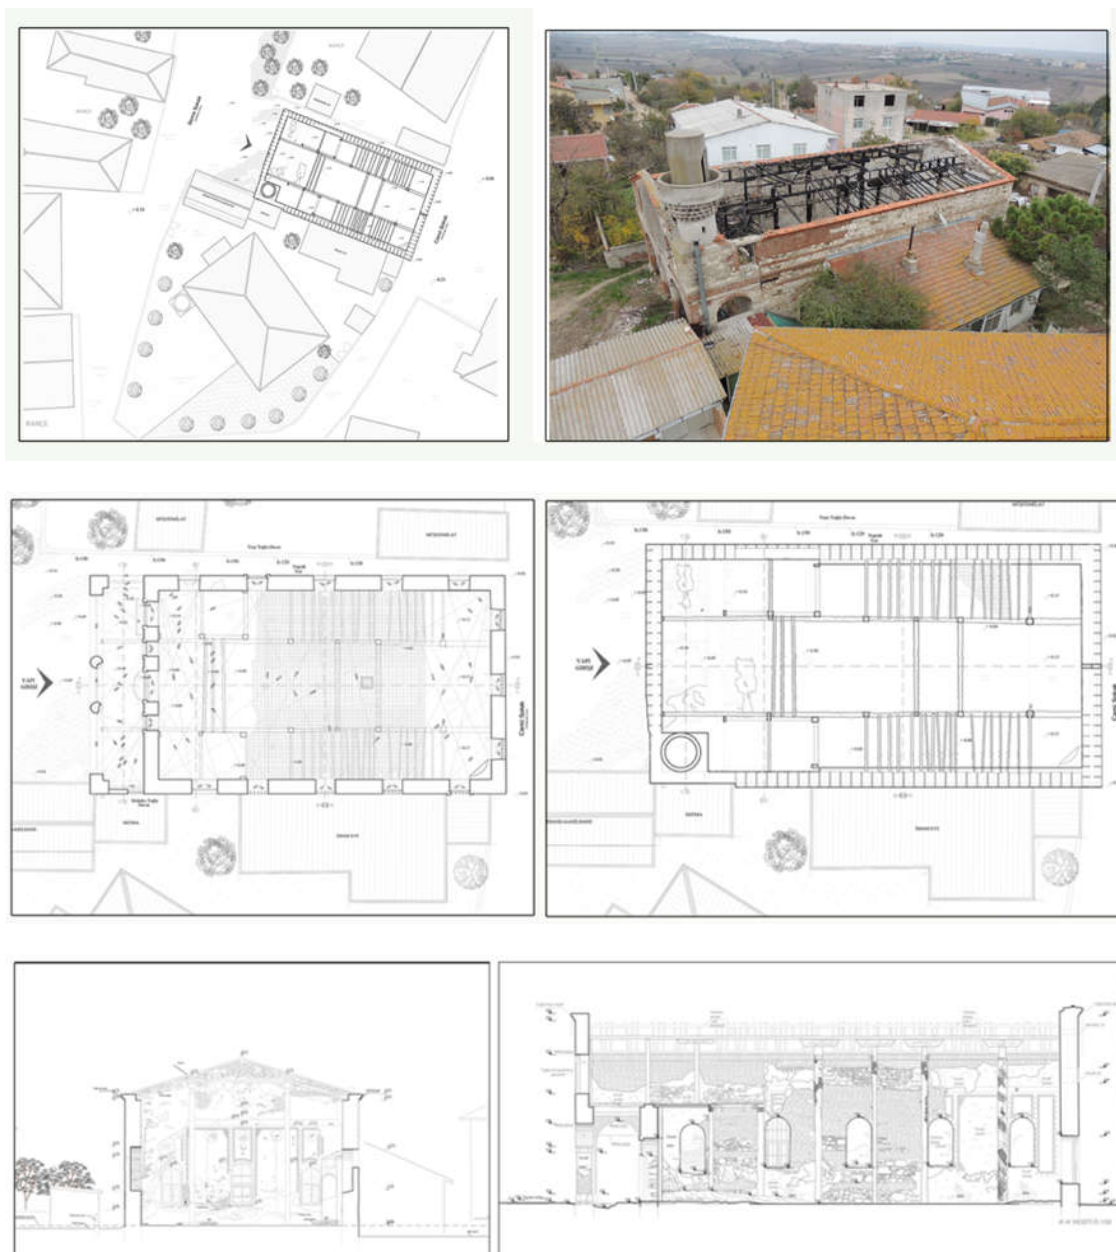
Measured drawings of the current situation of the building: (top left) site plan (drawing scale: 1/200), (top right) general view of the building and environs, (middle left) ground floor plan, (middle right) Mahfil floor plan, (bottom left) lateral section, (bottom right) longitudinal section (drawing scale: 1/50) (authors' archive).
